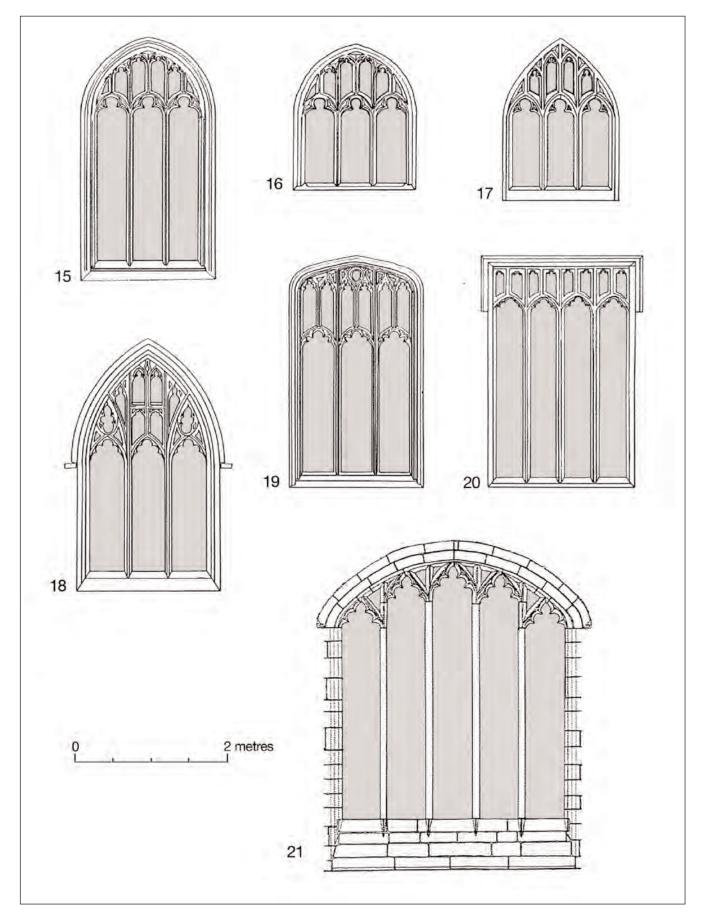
Typology of the medieval windows in St Peter's and St Mary's churches. 15 St P., south aisle, west wall; 16 St P., clerestory; 17 St M., clerestory; 18 St M., north aisle, west wall; 19 St P., south aisle, east wall; 20 St M., north aisle; 21 St P., chancel, east wall. Scale 1:50. After Bryant 2003 (except 21)
